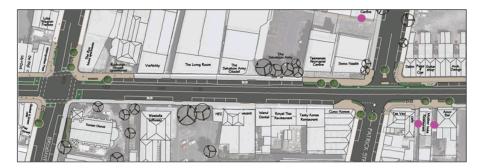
Concept plan for Brisbane Street to Patrick Street
